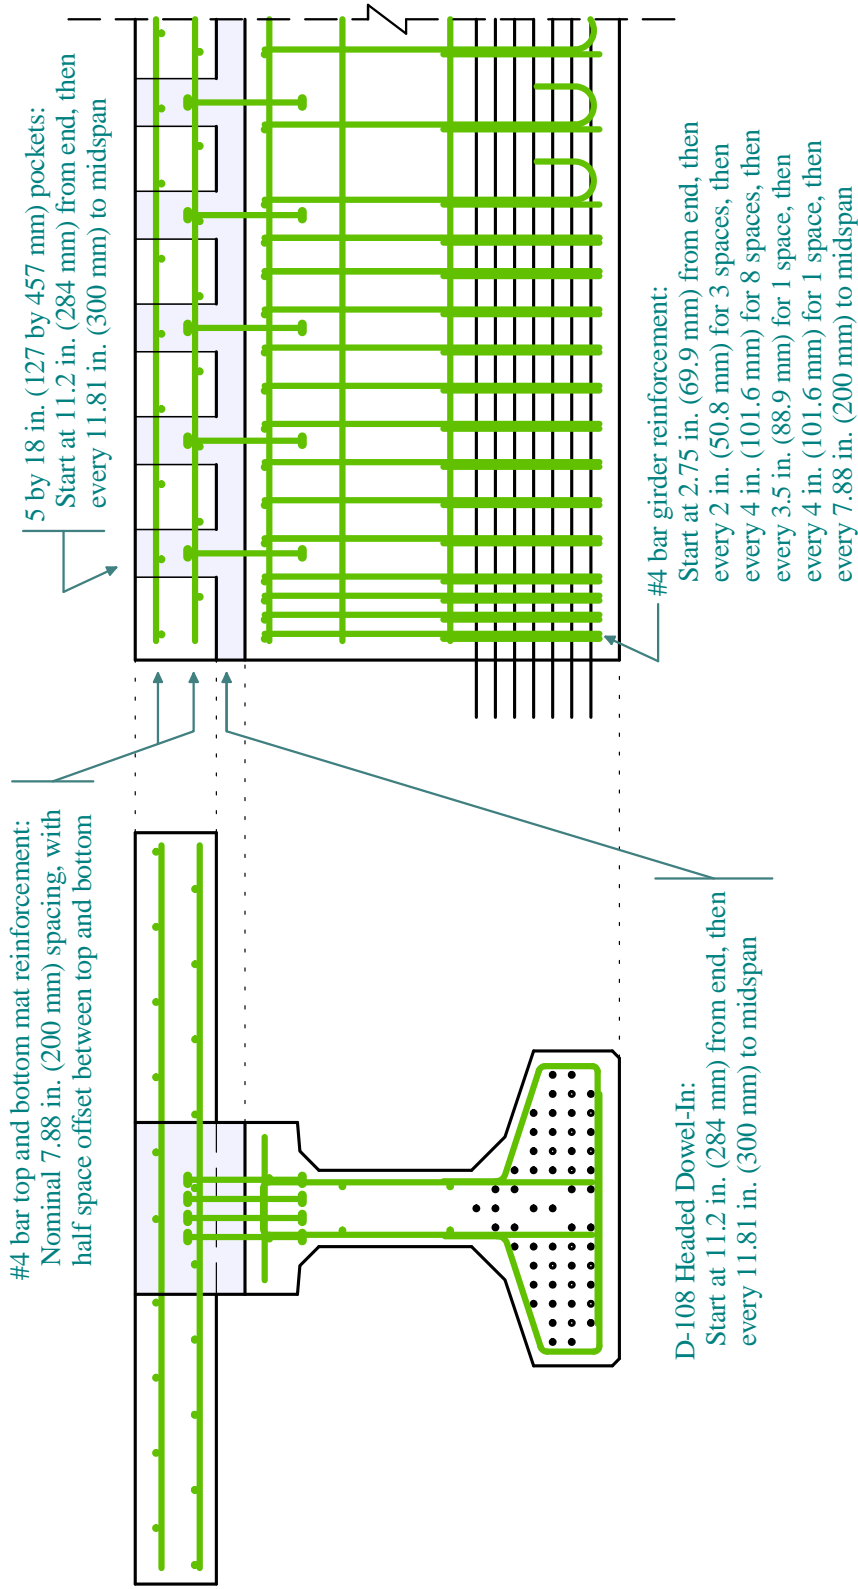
Illustration. Conventional composite connection: Longitudinal cross section of concrete girder connection.
